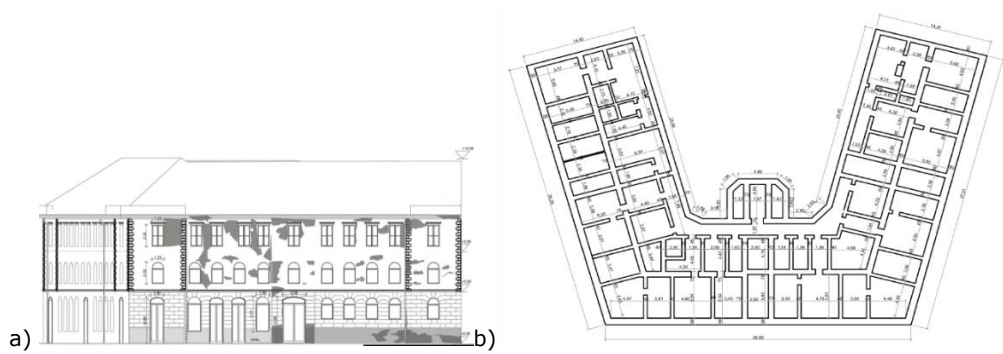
Survey of Elite's Palace: a) main façade; b) basement plan [252]
